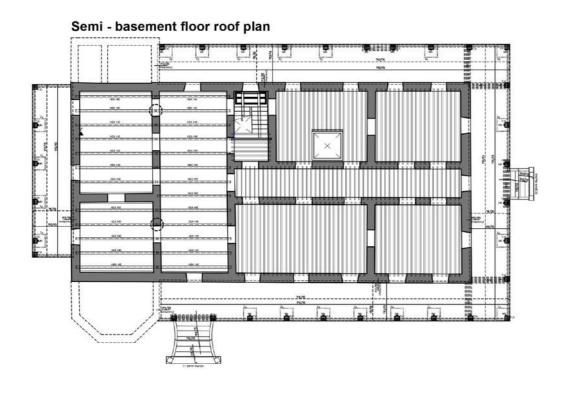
Construction phase pictures and details – Semi -basement ceiling / ground floor floor construction. © C. Marathovouniotis
